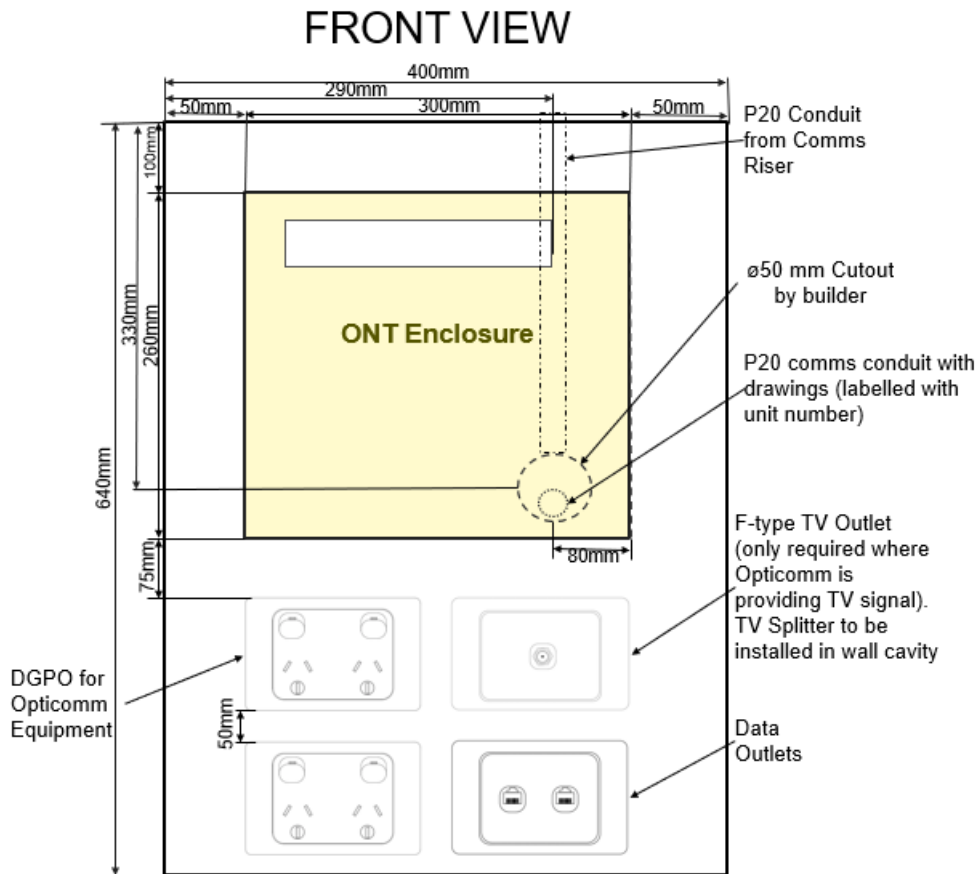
Typical apartment layout with minimum clearances (vertical arrangement)
